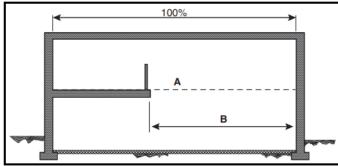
(3)-A Concept of Horizontal Plane
